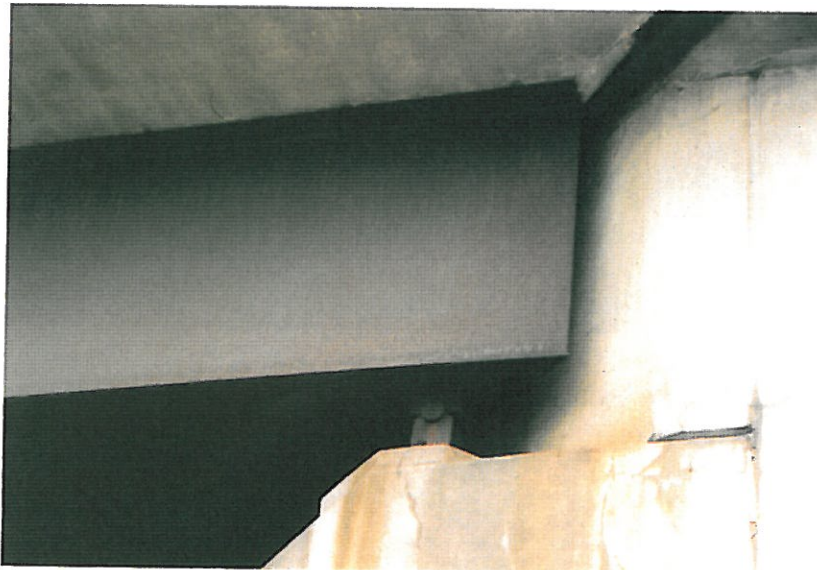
MD Route I-895 over I-95; End of girder - Built 1970
